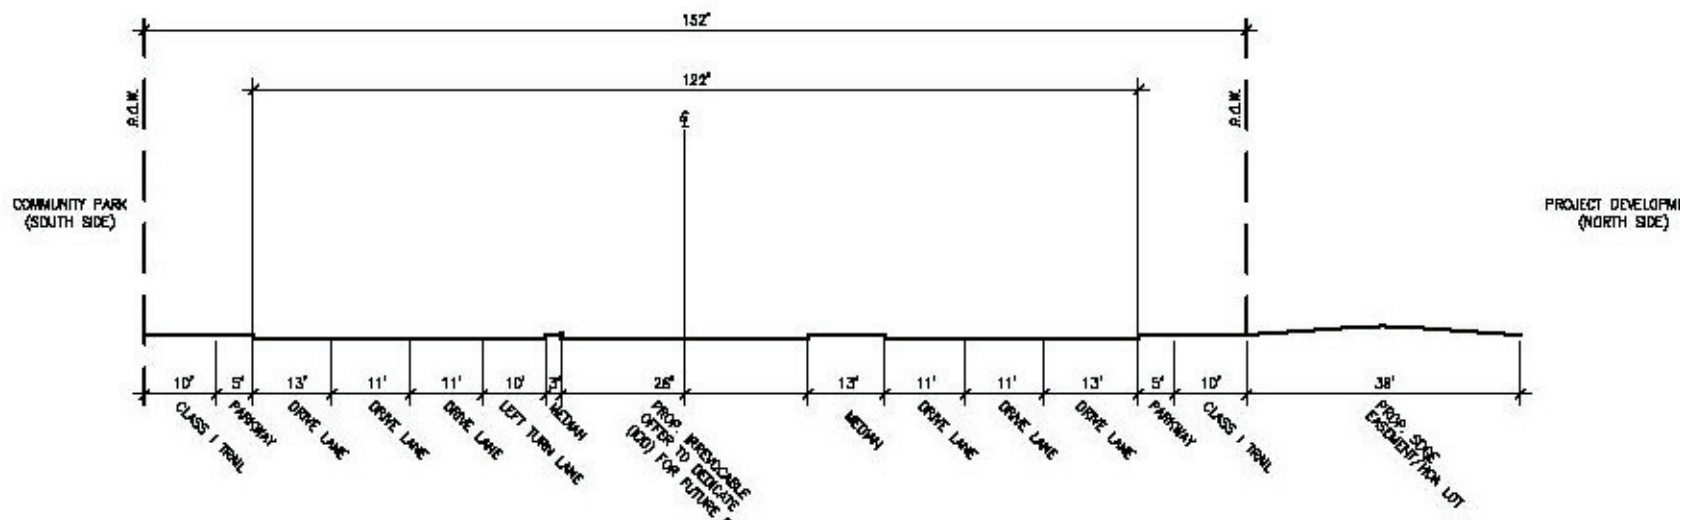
STANDARD CROSS SECTION OF CARROLL CANYON ROAD (SECTION C-C)
